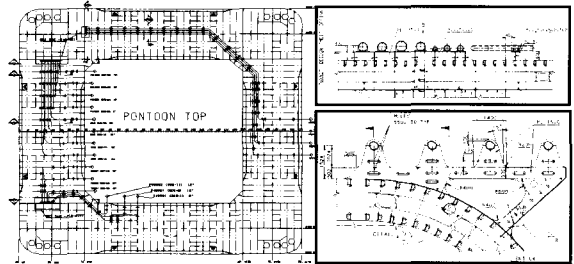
Support of Riser Hard Piping and Umbilical I-Tube
